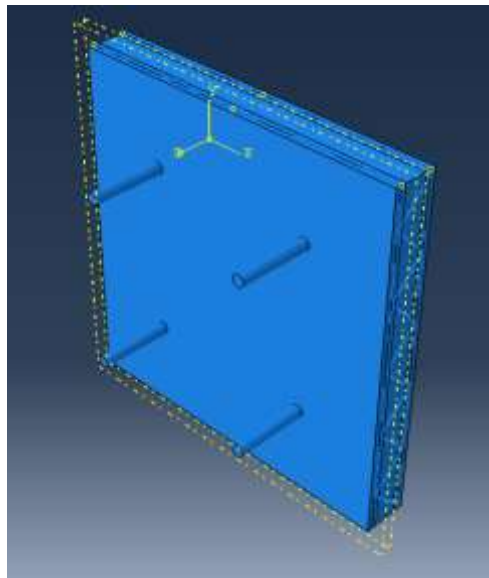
MSE Wall with 3D Welded Wire Panel
